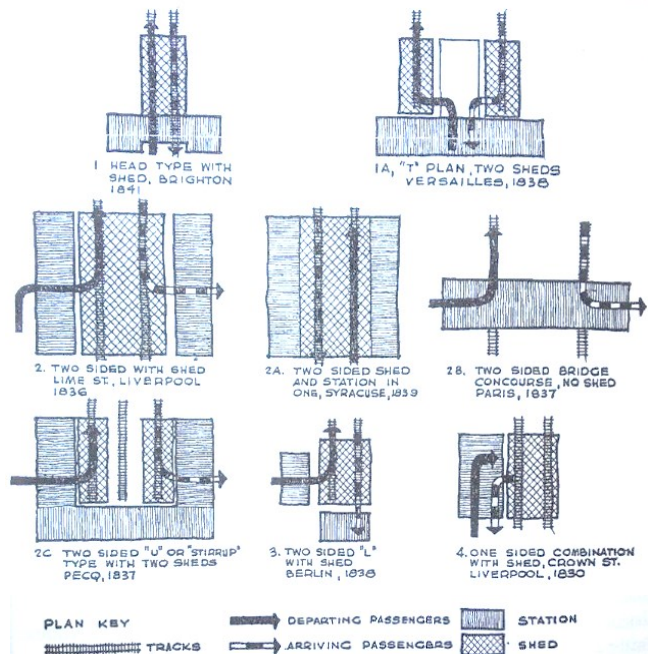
Early 3 types of station plan showing one – sided, two – sided and head house plan (Meeks, 1956).
